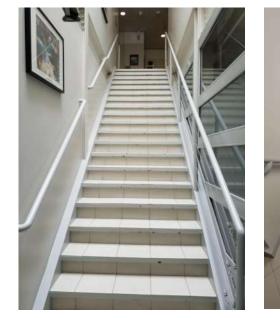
STAIR 4/D PHOTO 5: STAIR 5/E
